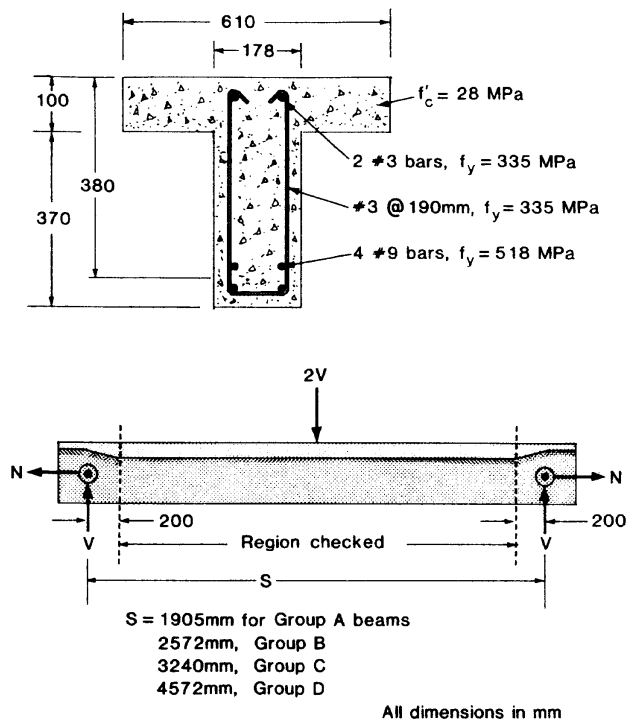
Cross section and loading details for University of Washington test beams⁷
